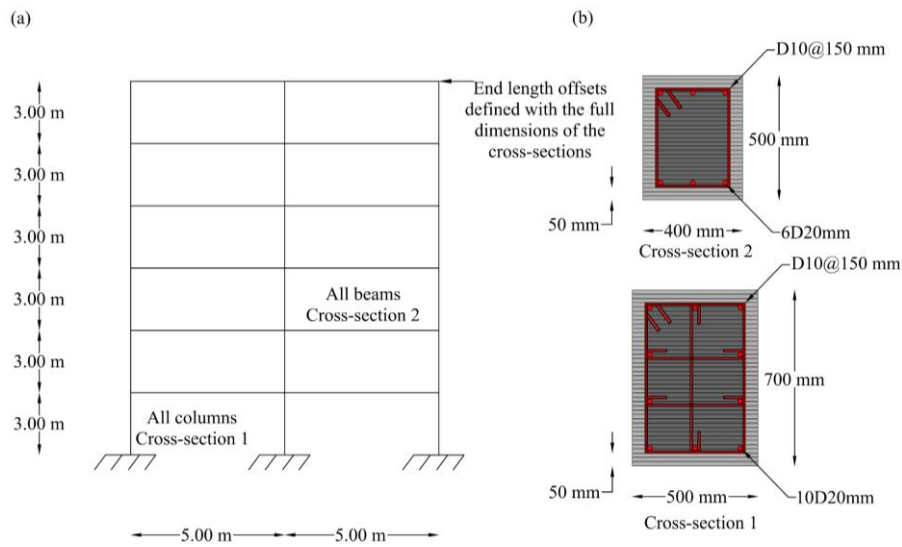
(a) Geometric dimensions and identification of the column and beam elements of the concrete frame, (b) cross-section discretisation and longitudinal and transverse reinforcement.
